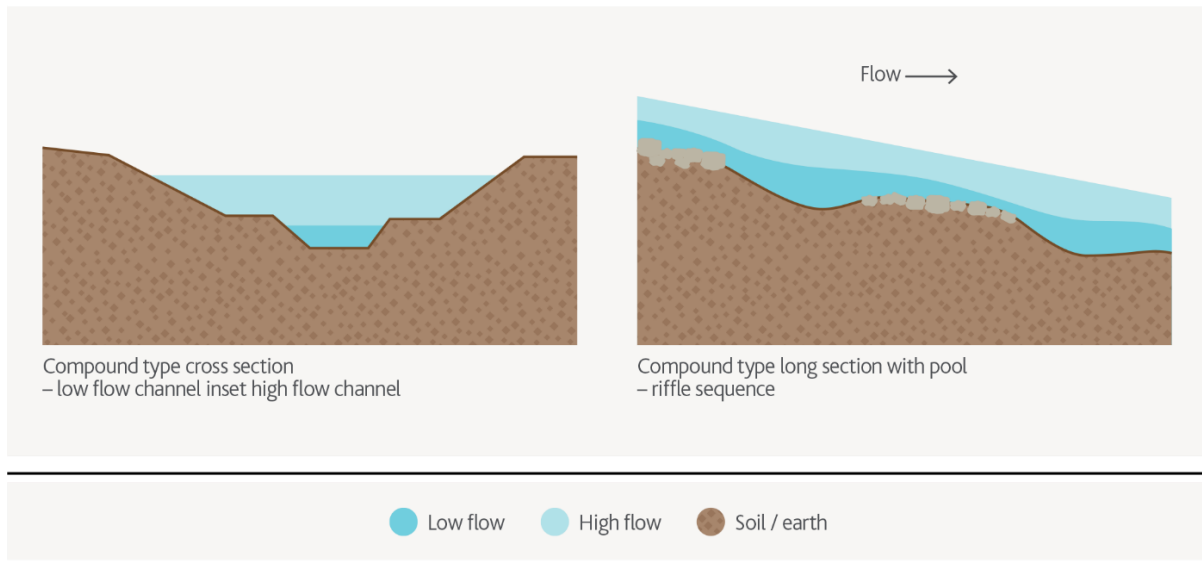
Compound waterway type indicative cross section and longitudinal section profile and planform
